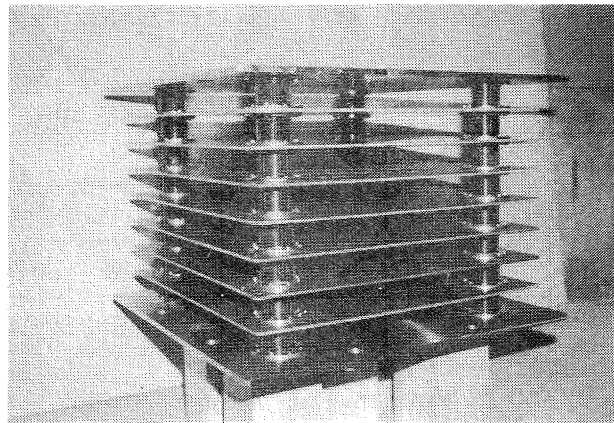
Rubber Bearings of 490 kN Rated Load in Static Tests.
